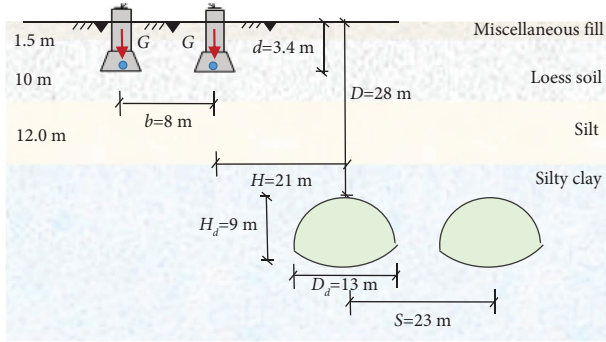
Schematic diagram of stratum distribution and location relationship between new tunnel and tower foundation.
